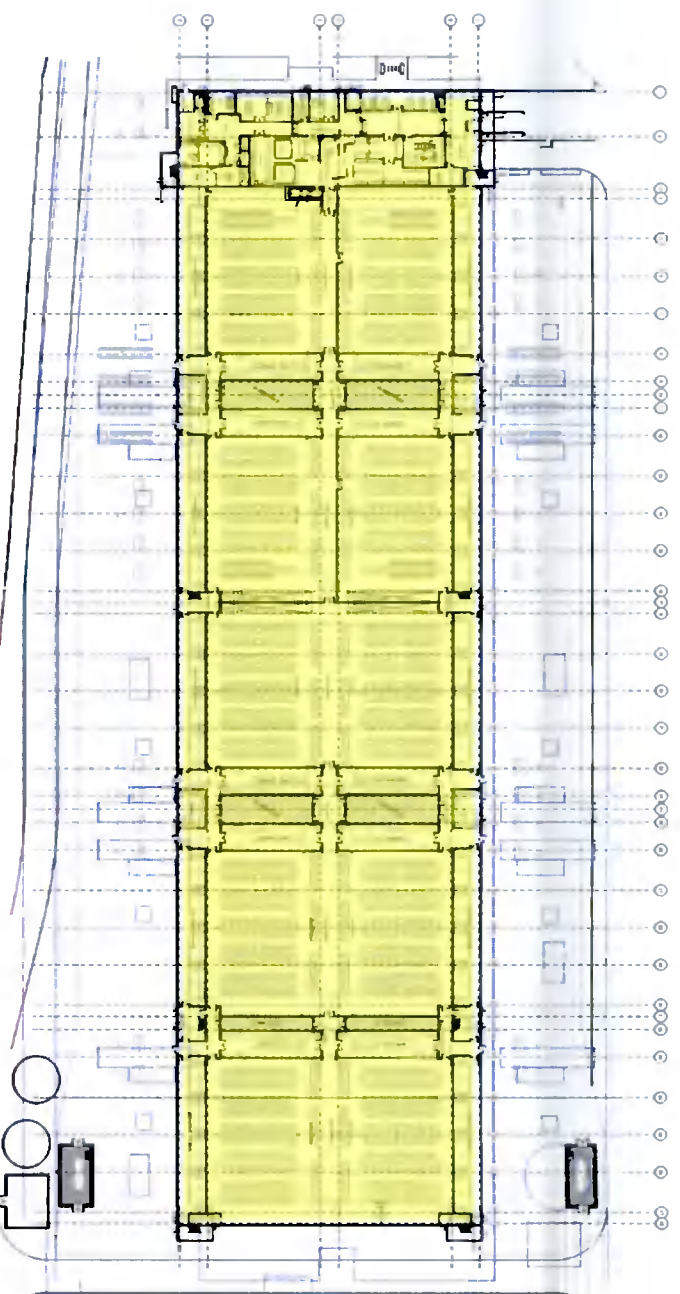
DUB 15 – GROUND FLOOR – DESIGN MODIFICATIONS –
